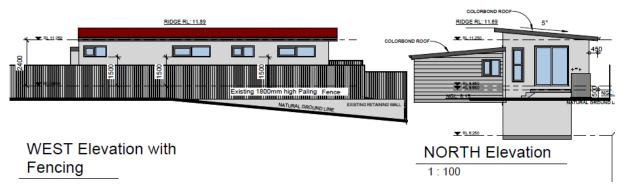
Western Elevation (with fencing). Source: Advanced Architecture & Construction
